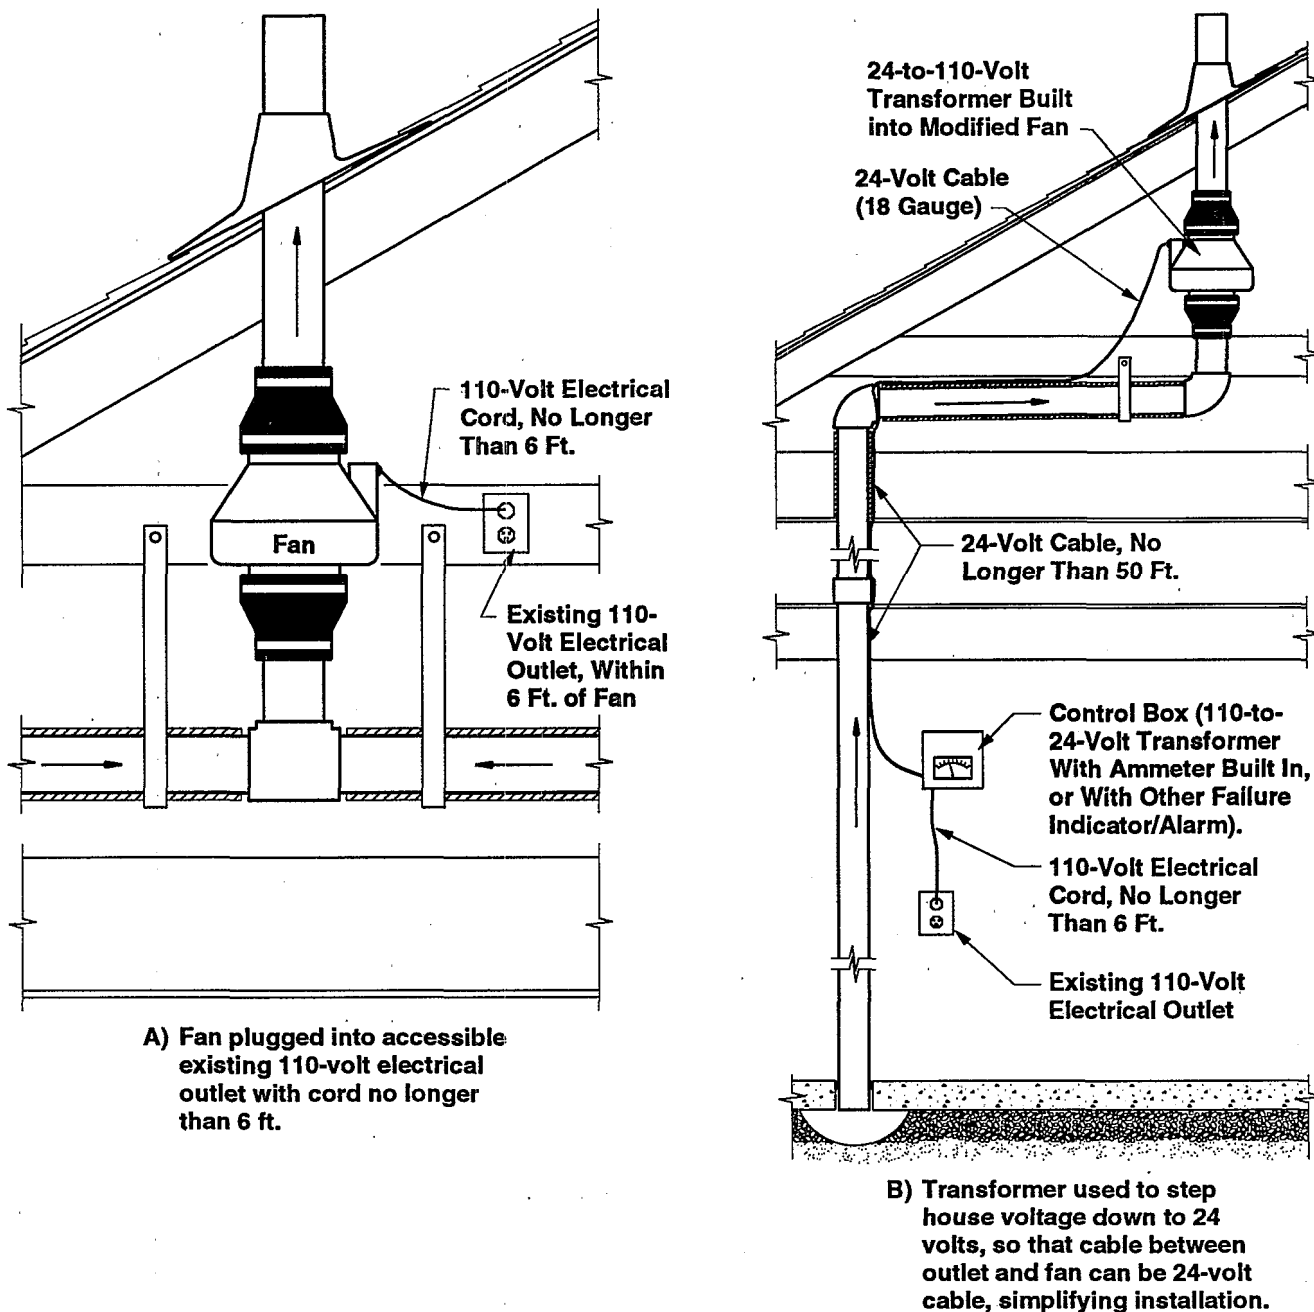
Some alternative approaches that can sometimes be considered for wiring SSD fans mounted in attics.
